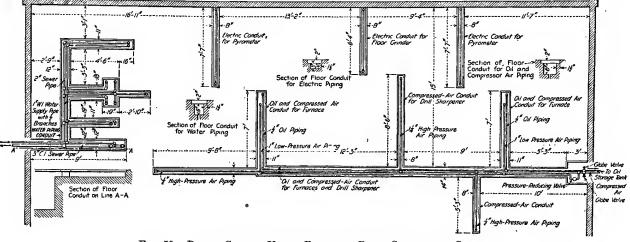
PIPING SYSTEM UNDER F LOOR OF DRILL SHARPENING SHOP
